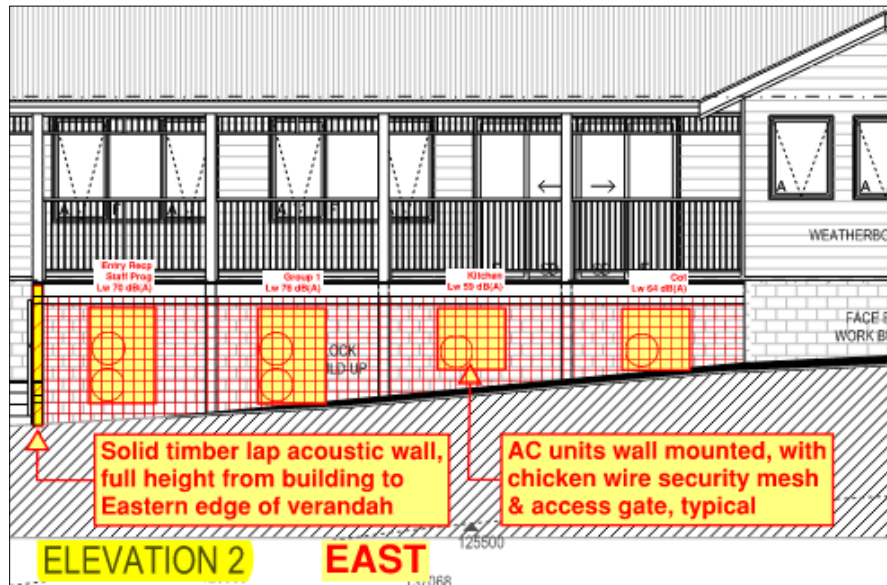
AIR CONDITIONING – GENERAL ARRANGEMENT EAST
